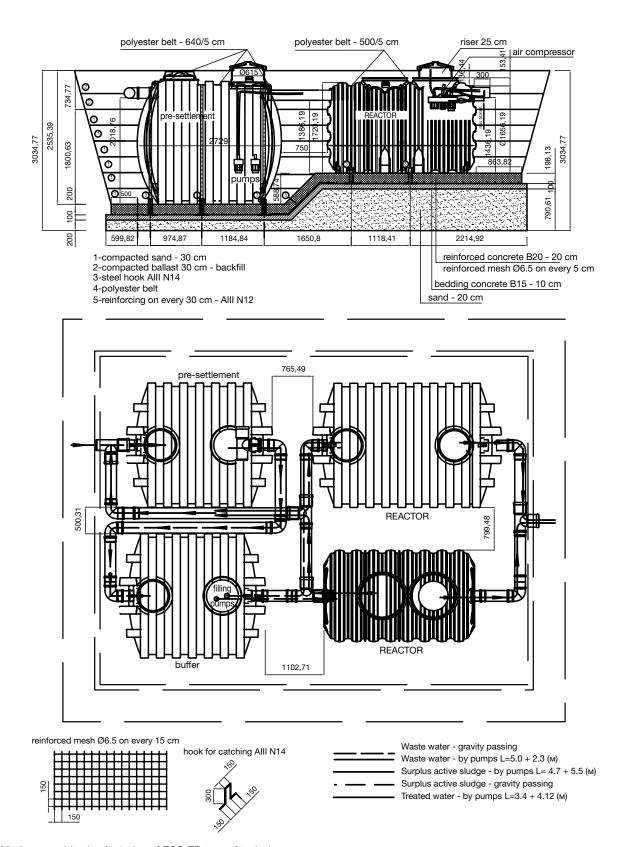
An assembly plan for laying of ECO-TR type of tanks in green areas
